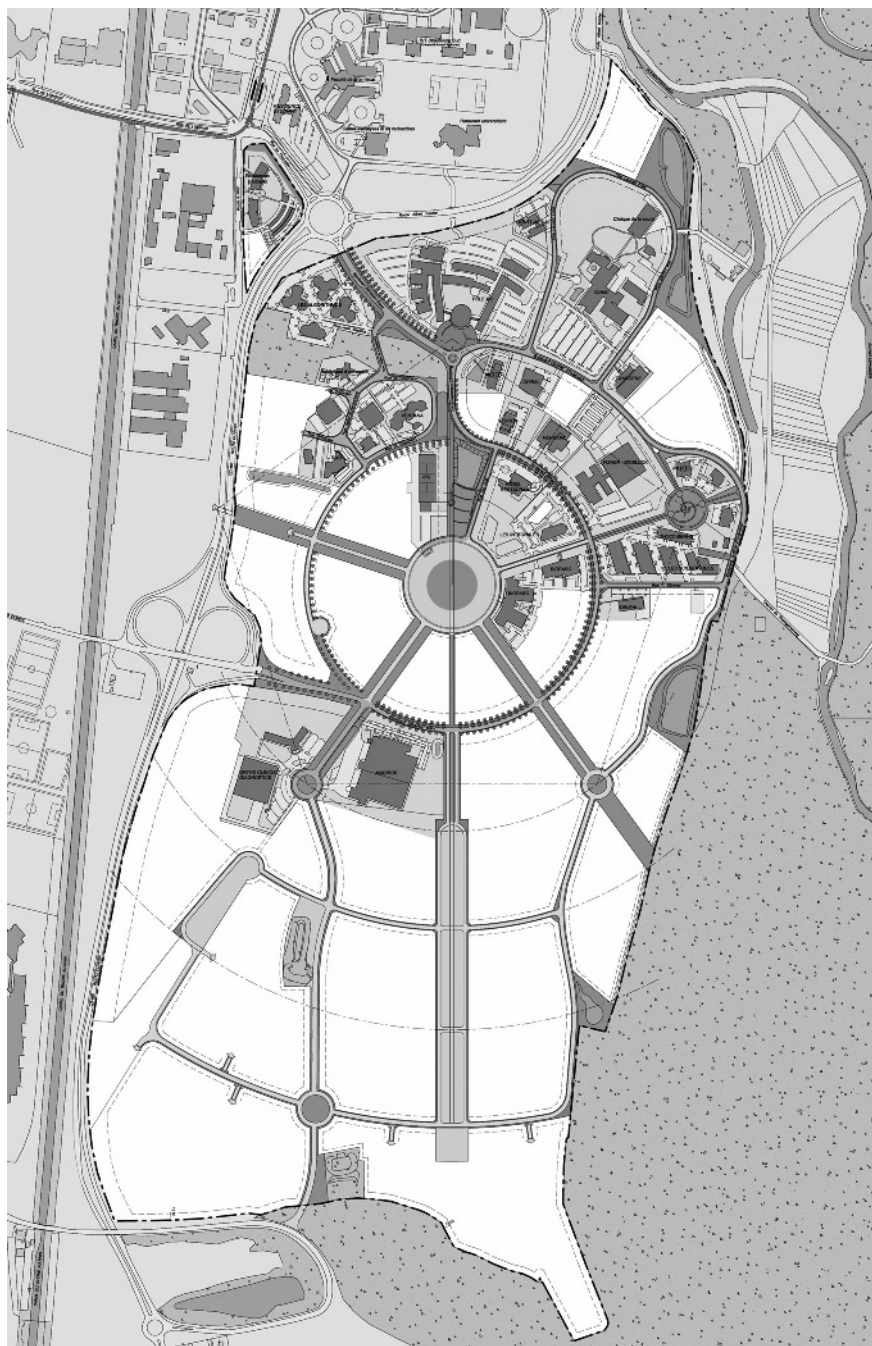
Detailed plan of the Parc d'Innovation d'Illkirch. Urban Planners: Maechel, Delauny, Jund. Architects: A. Zubléna and J.M. Blondelle.
